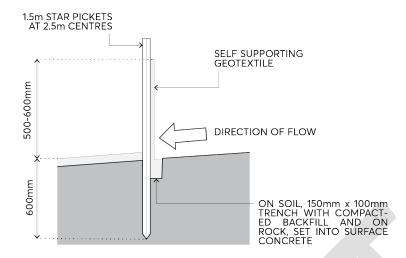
Section - Sedimentation fencing (Source: Soils and Construction: Managing Urban Stormwater, Landcom, March 2004)
